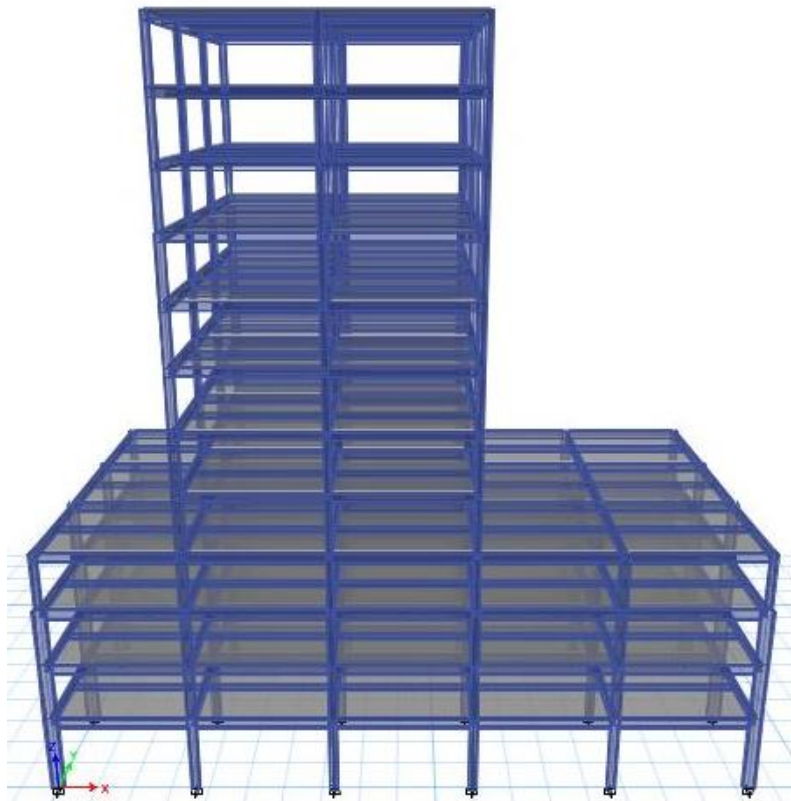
3D view of (2Rx1L) 12 story elevation
